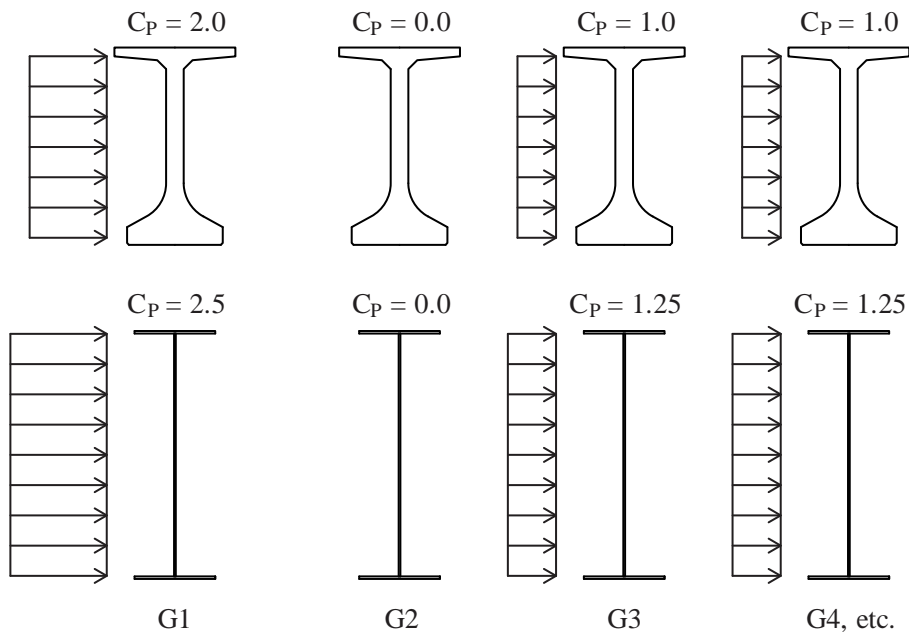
Recommended design wind loads for systems of adjacent girders
